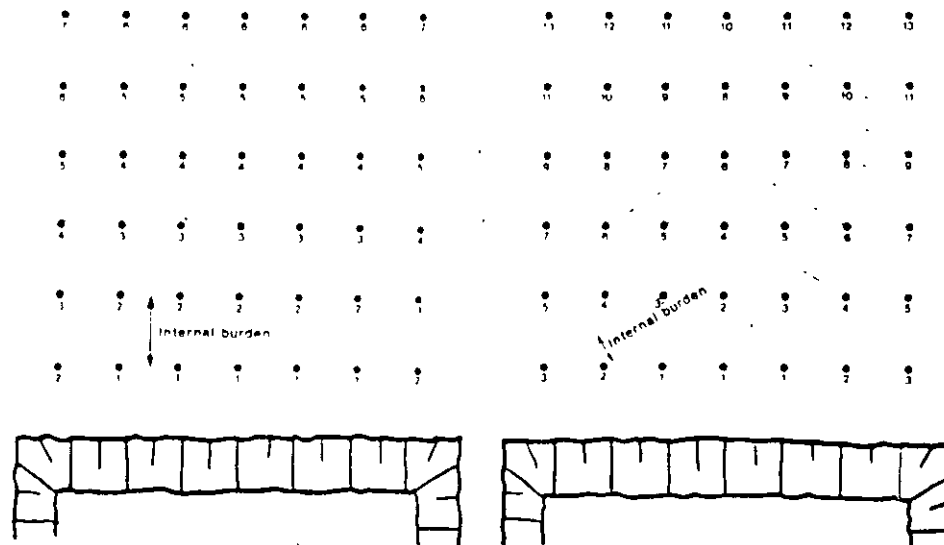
By changing the firing pattern, the internal burden may be minimized and the constriction lowered.
